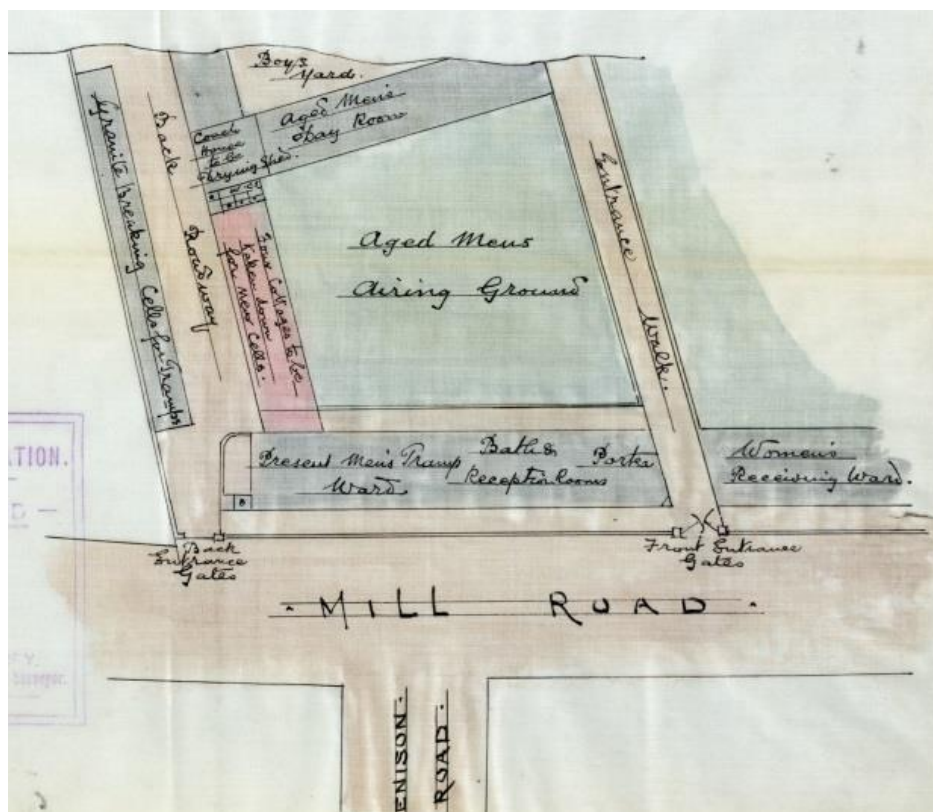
1897 Tramps cells, block plan (CA: G/C/AP11 : Planning Permission 1167)
